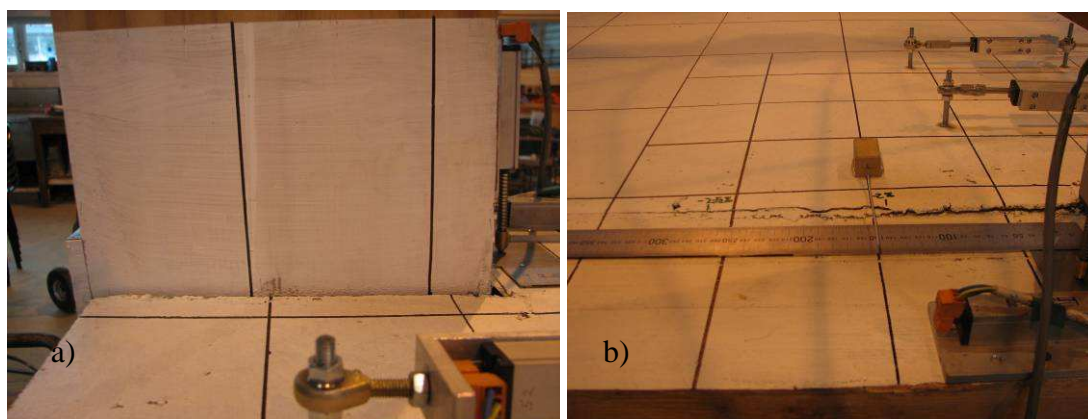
a) Relative movement between the floor slab and column -4.5% drift
